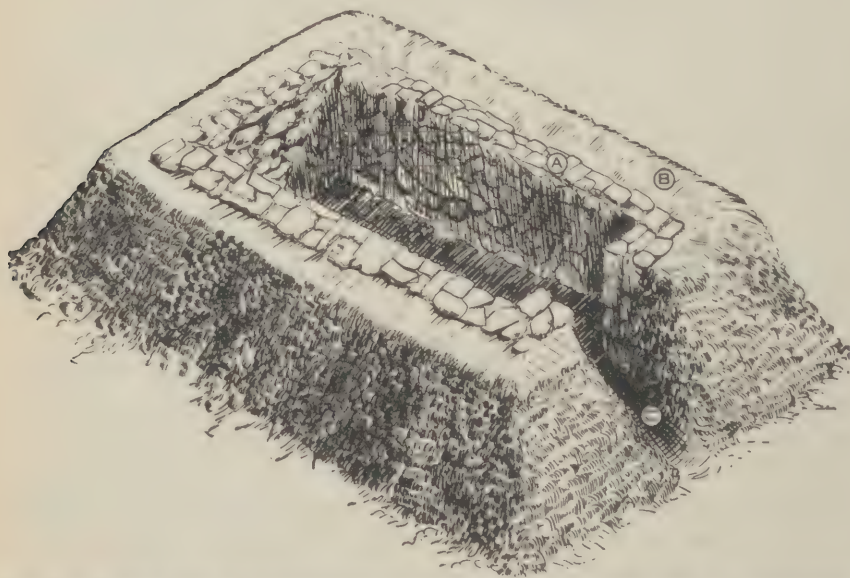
Rock pit incinerator (Schematic). A—Rock wall. B—Earthen embankment to support rock walls. C—Open end to permit draft.
